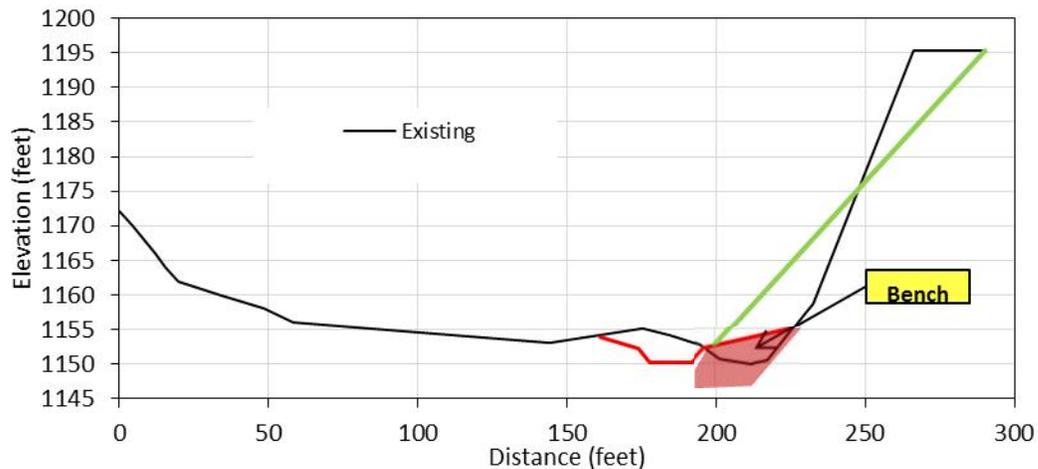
Existing, proposed, and expected typical cross section at a typical bluff stabilization site. The existing ground (black line) shows the channel scouring at the toe of the bluff on the right side of the valley. The proposed channel (red line) will be excavated away from the bluff toe to allow room for placement of the treatment (riprap or cribwall) and to provide room for the upper bank material to slump over (green line).
